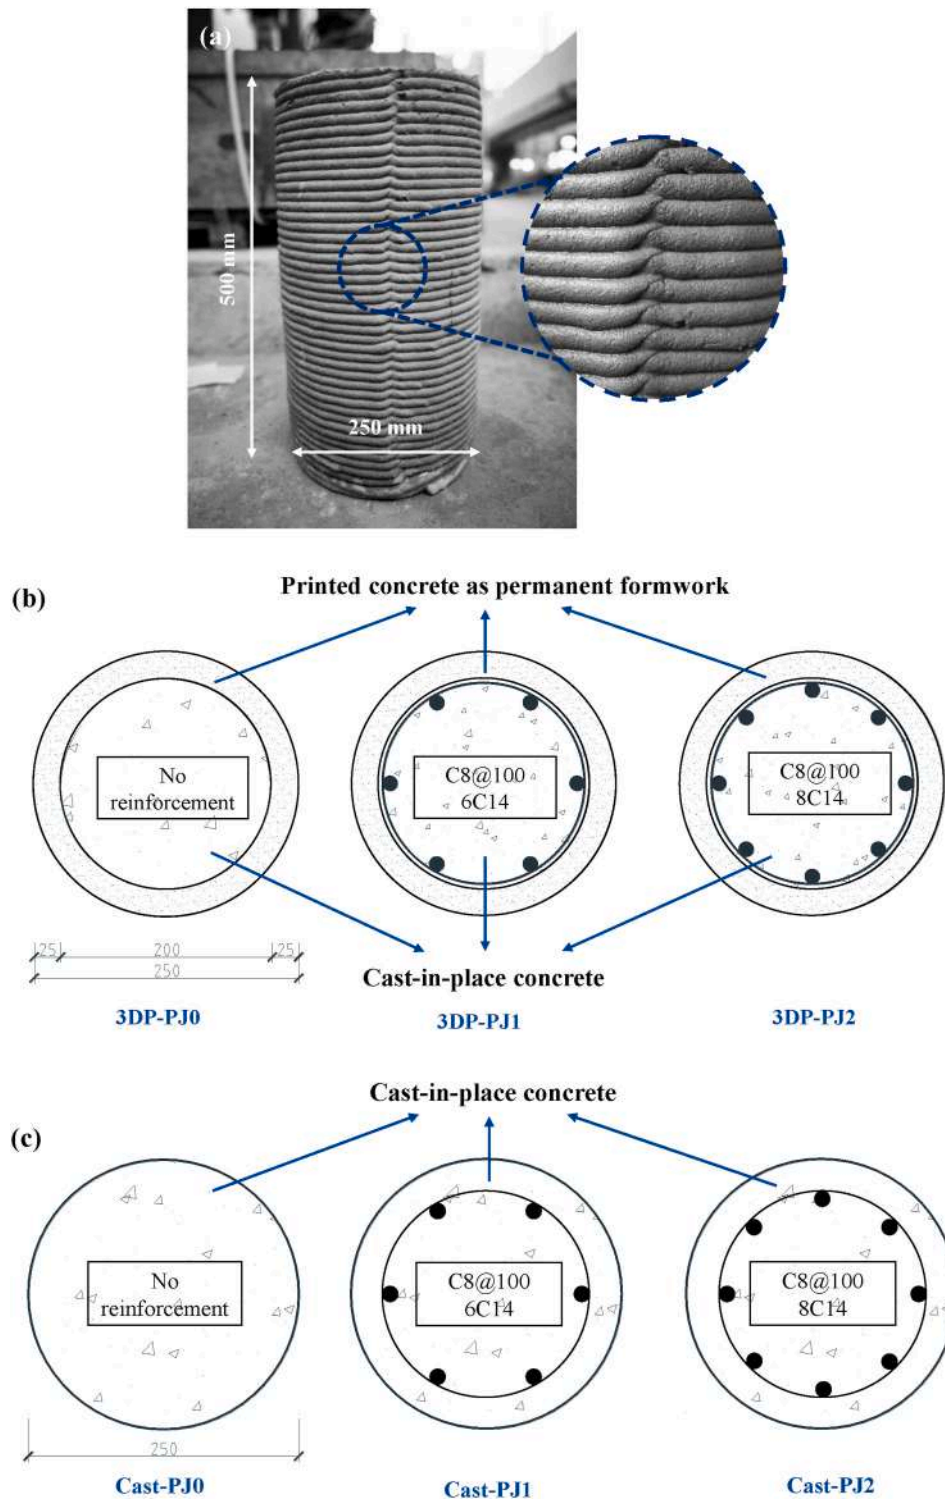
(a) The composite column with using 3D printed concrete as permanent formwork, (b) Cross sections and reinforcement details of the composite columns, and (c) Cross sections and reinforcement details of the cast-in-place columns (unit: mm).
